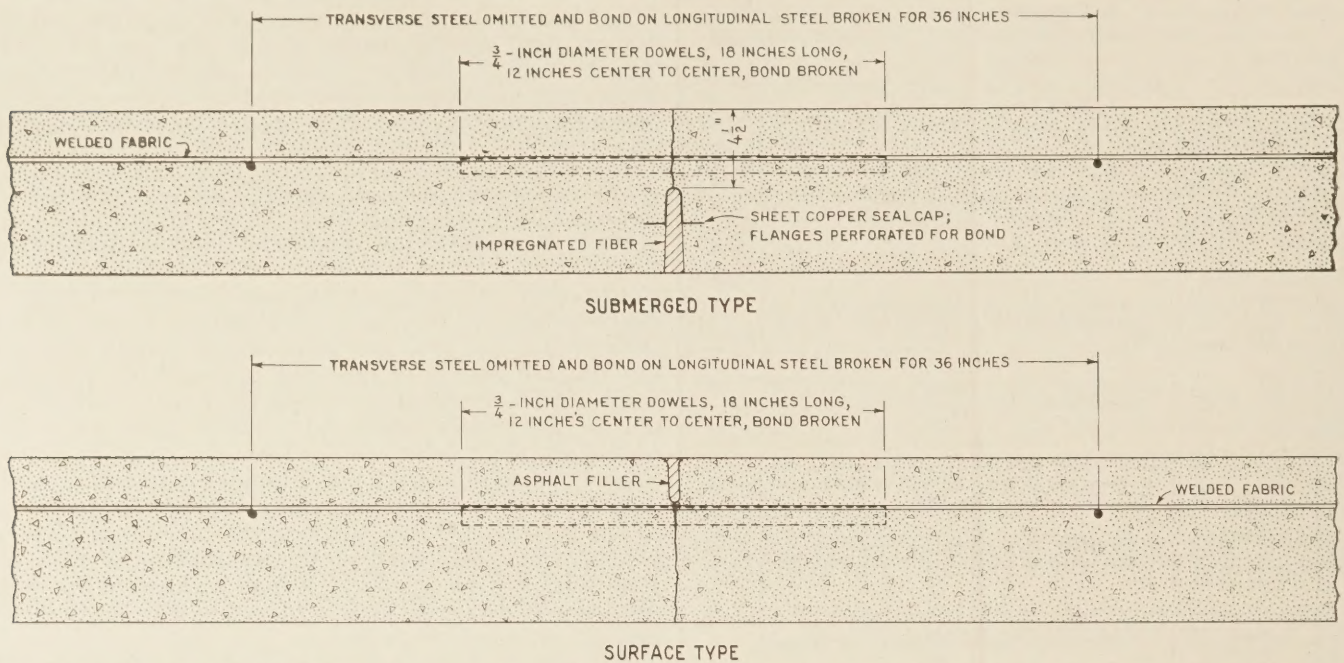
DETAILS OF WEAKENED-PLANE JOINTS. DOWELS OMITTED IN JOINTS IN ONE-HALF THE LENGTH OF EACH SECTION.
